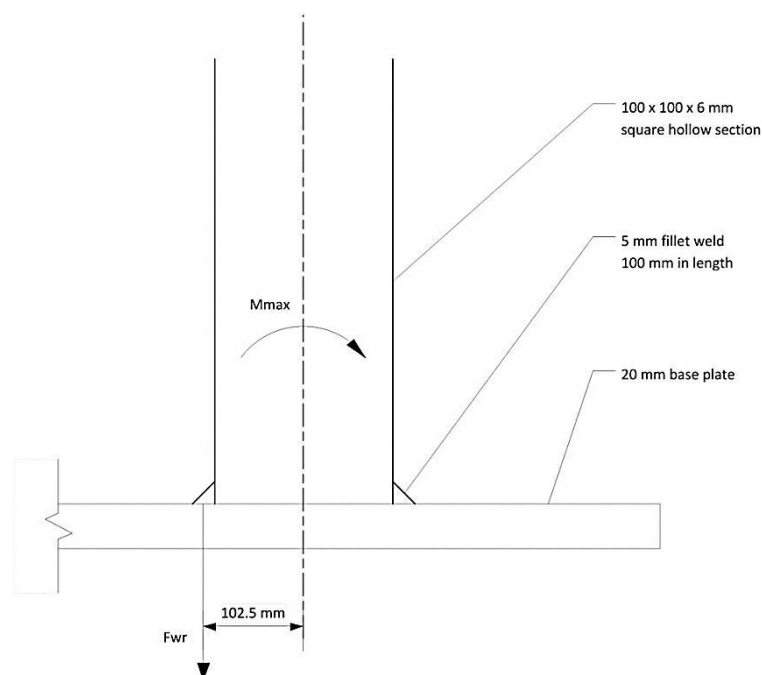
Side view of the forces resisted by the base plate welds.
